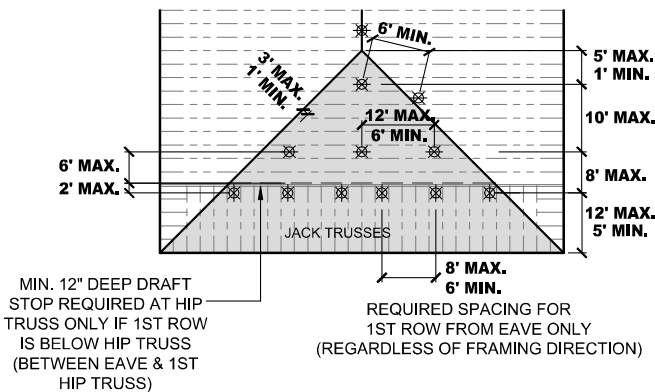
A: HIP LAYOUT CRITERIA WHEN FIRST ROW OF SPRINKLERS PLACED "WITHIN" JACK TRUSSES
